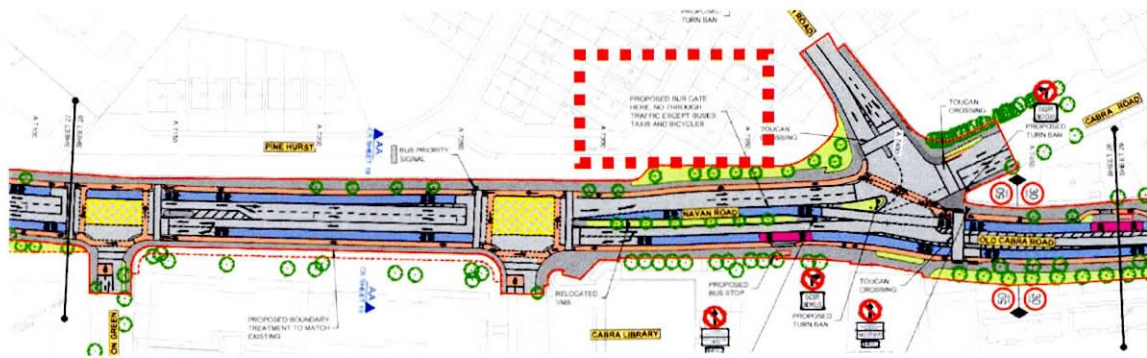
Extract from Sheet 28 of the General Arrangement drawing illustrating the proposed bus gate (red dashed line) at the junction of Navan Road, Cabra Road and Old Cabra Road.
